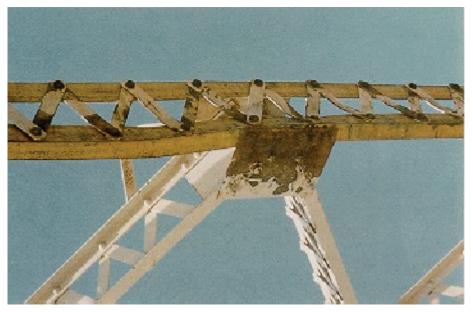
(q)Top Lateral Bracing in Steel Through Truss
